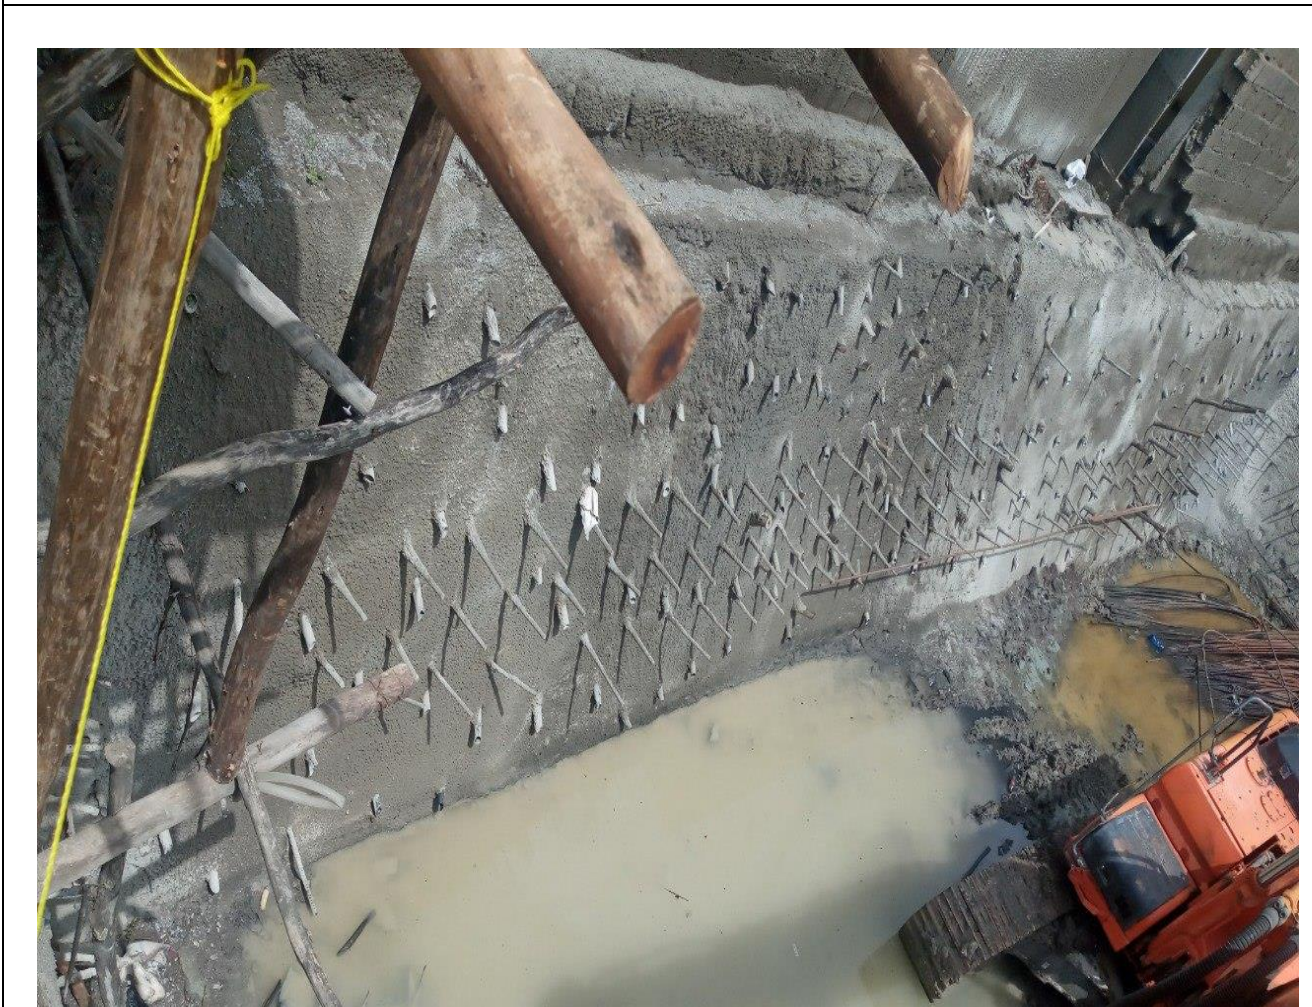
REINFORCEMENT SOIL NAILING WALL
